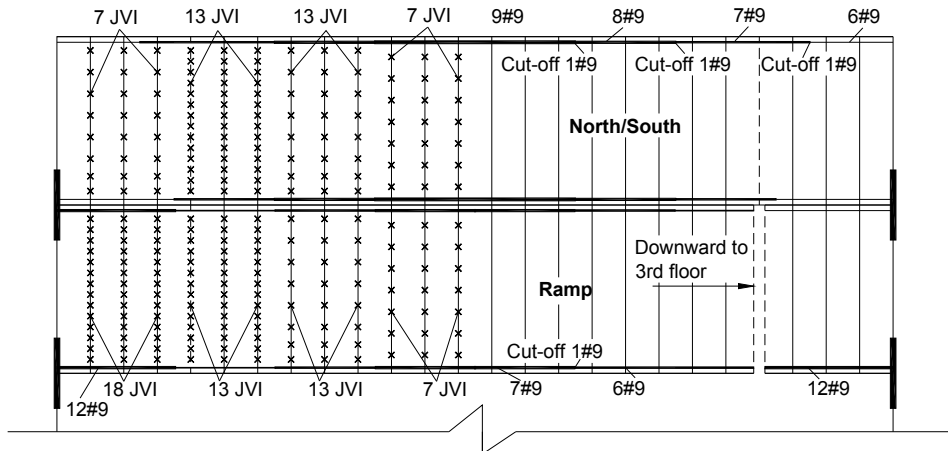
Diaphragm reinforcement at top floor for example 1A.
